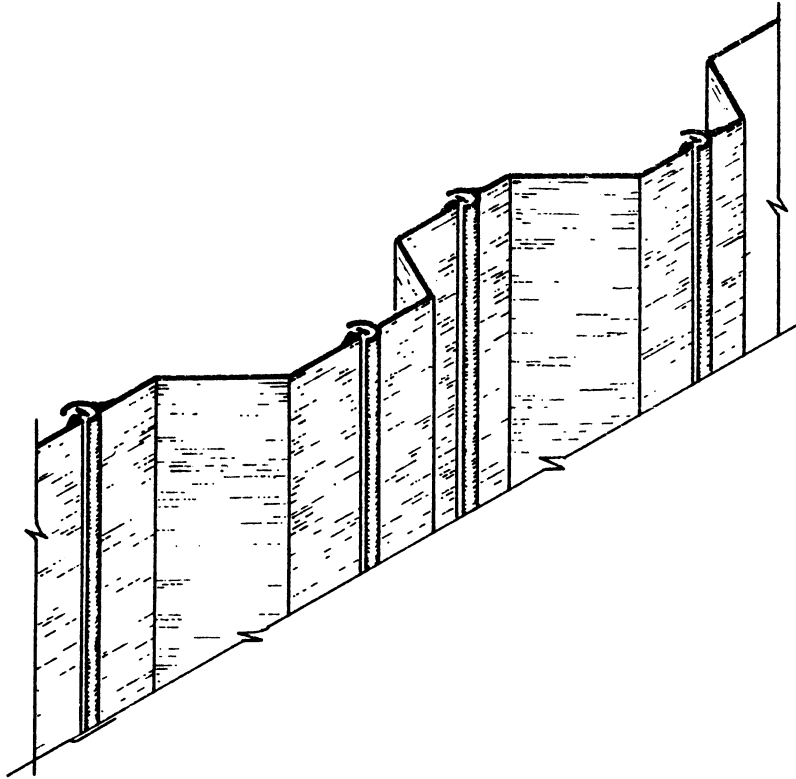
In-Place Steel Sheet Piling Cut-Off Wall
